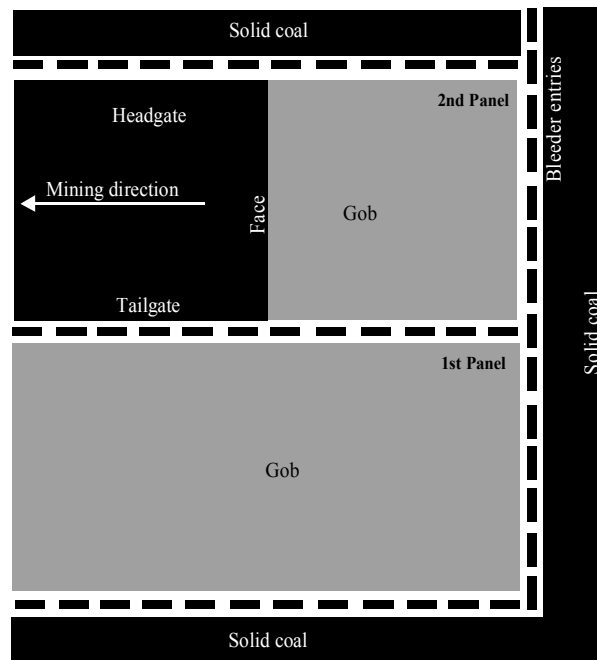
Typical longwall retreating panel layout employing 2-entry gateroad system
